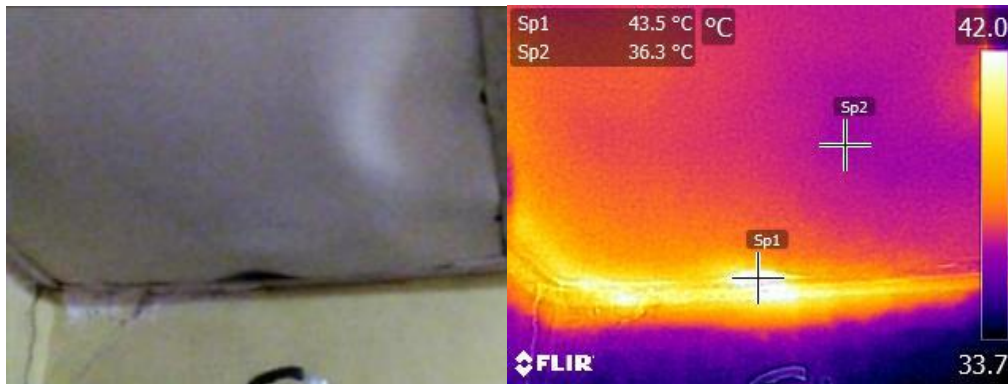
A poor connection between wall and false ceiling in the kitchen TM-NC.K.1
